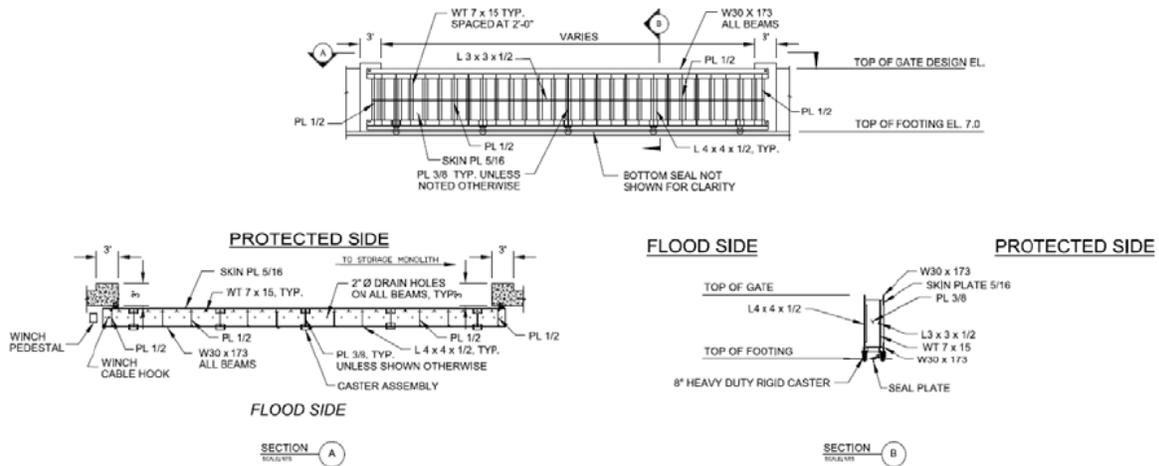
Roller Gate Typical Section (Moffat & Nichol, 2018)
